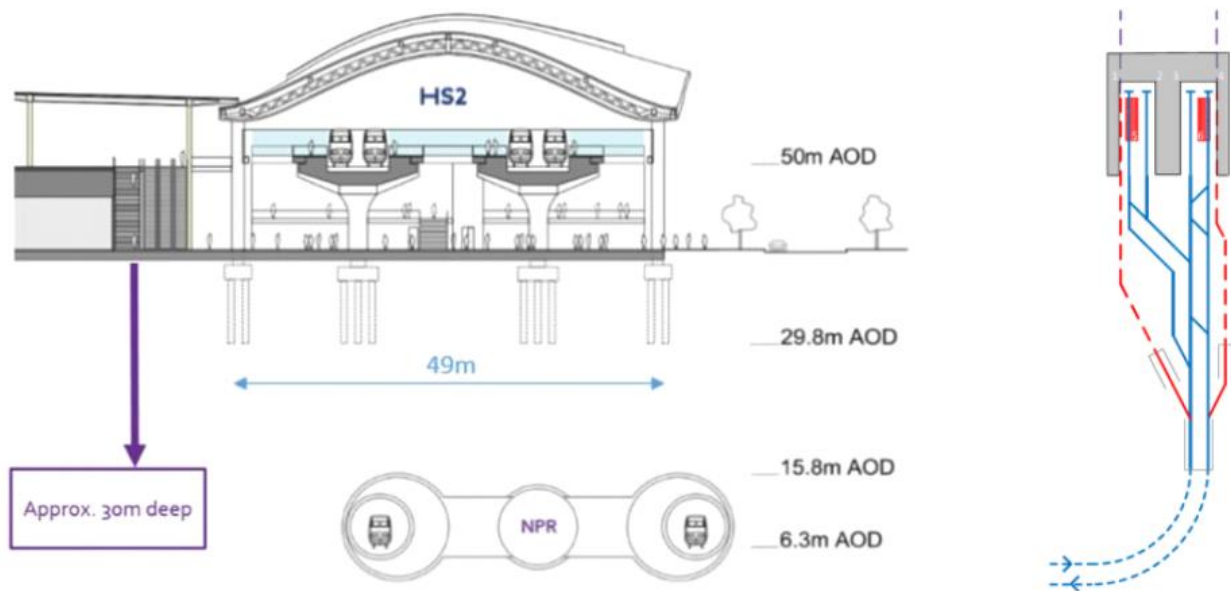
2D schematic and indicative layout of HS2's underground concept
